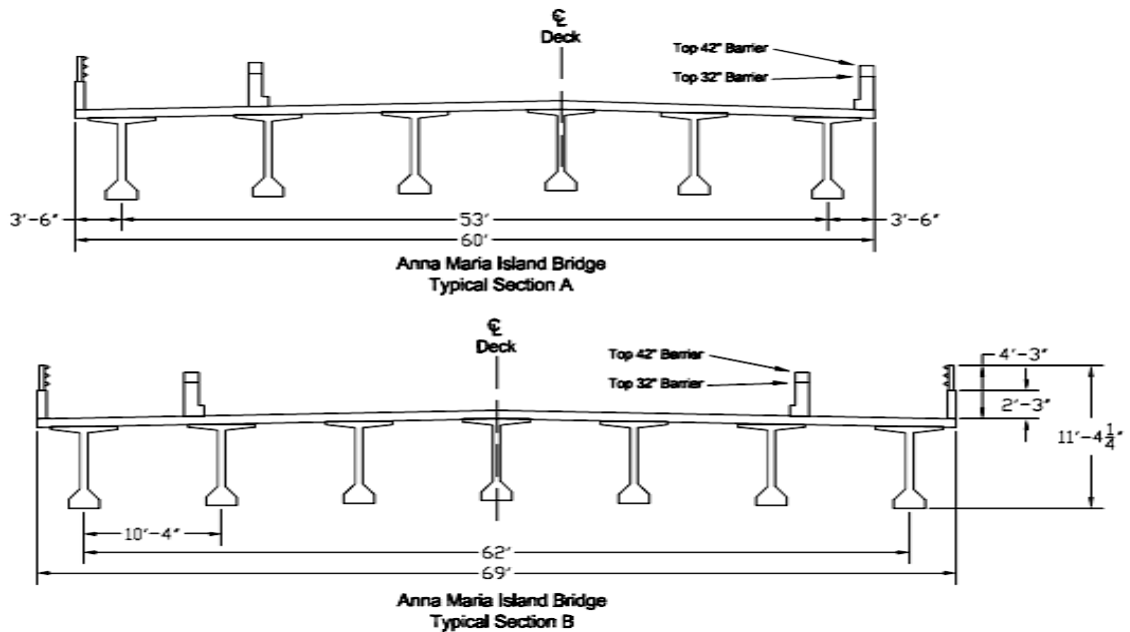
Section Views of Anna Marie Island Bridge Deck Alternatives (Mara & King, 2008)
